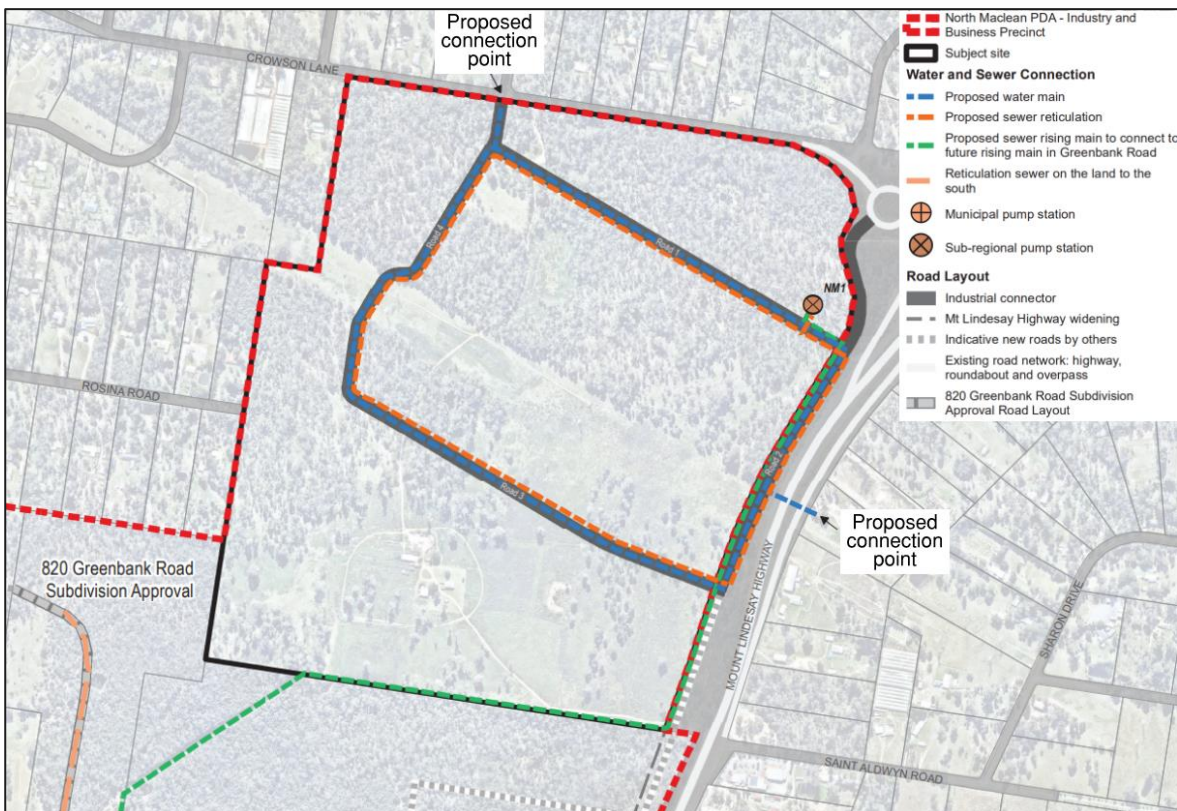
Endorsed EDQ Water & Sewer Context Plan
